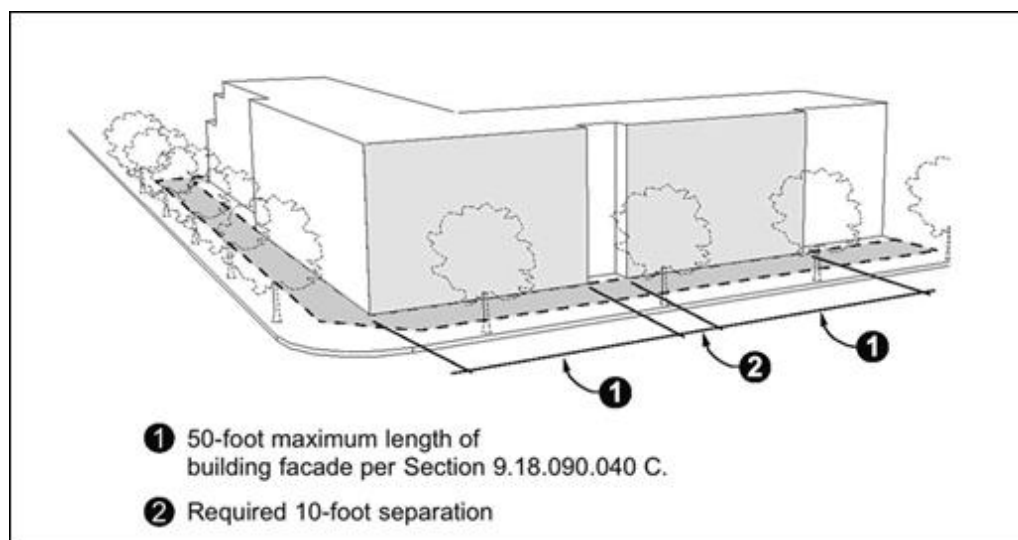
CC-1 Maximum Length of Building Façade
